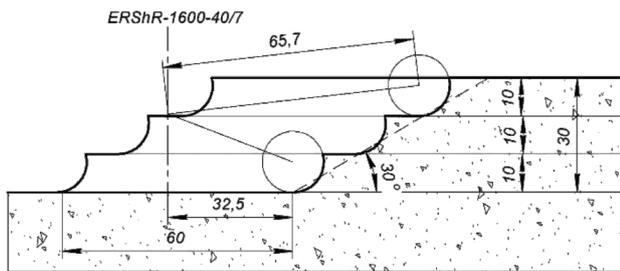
Excavator mining face profile ERS_hR-1600-40/7 when working out the overburden bench with a height of 30 m
